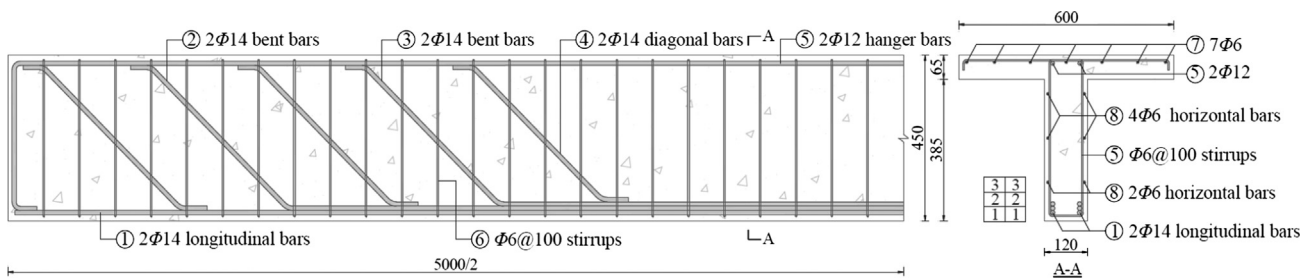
Section dimension and reinforcement steel of the beam (Unit: mm).
